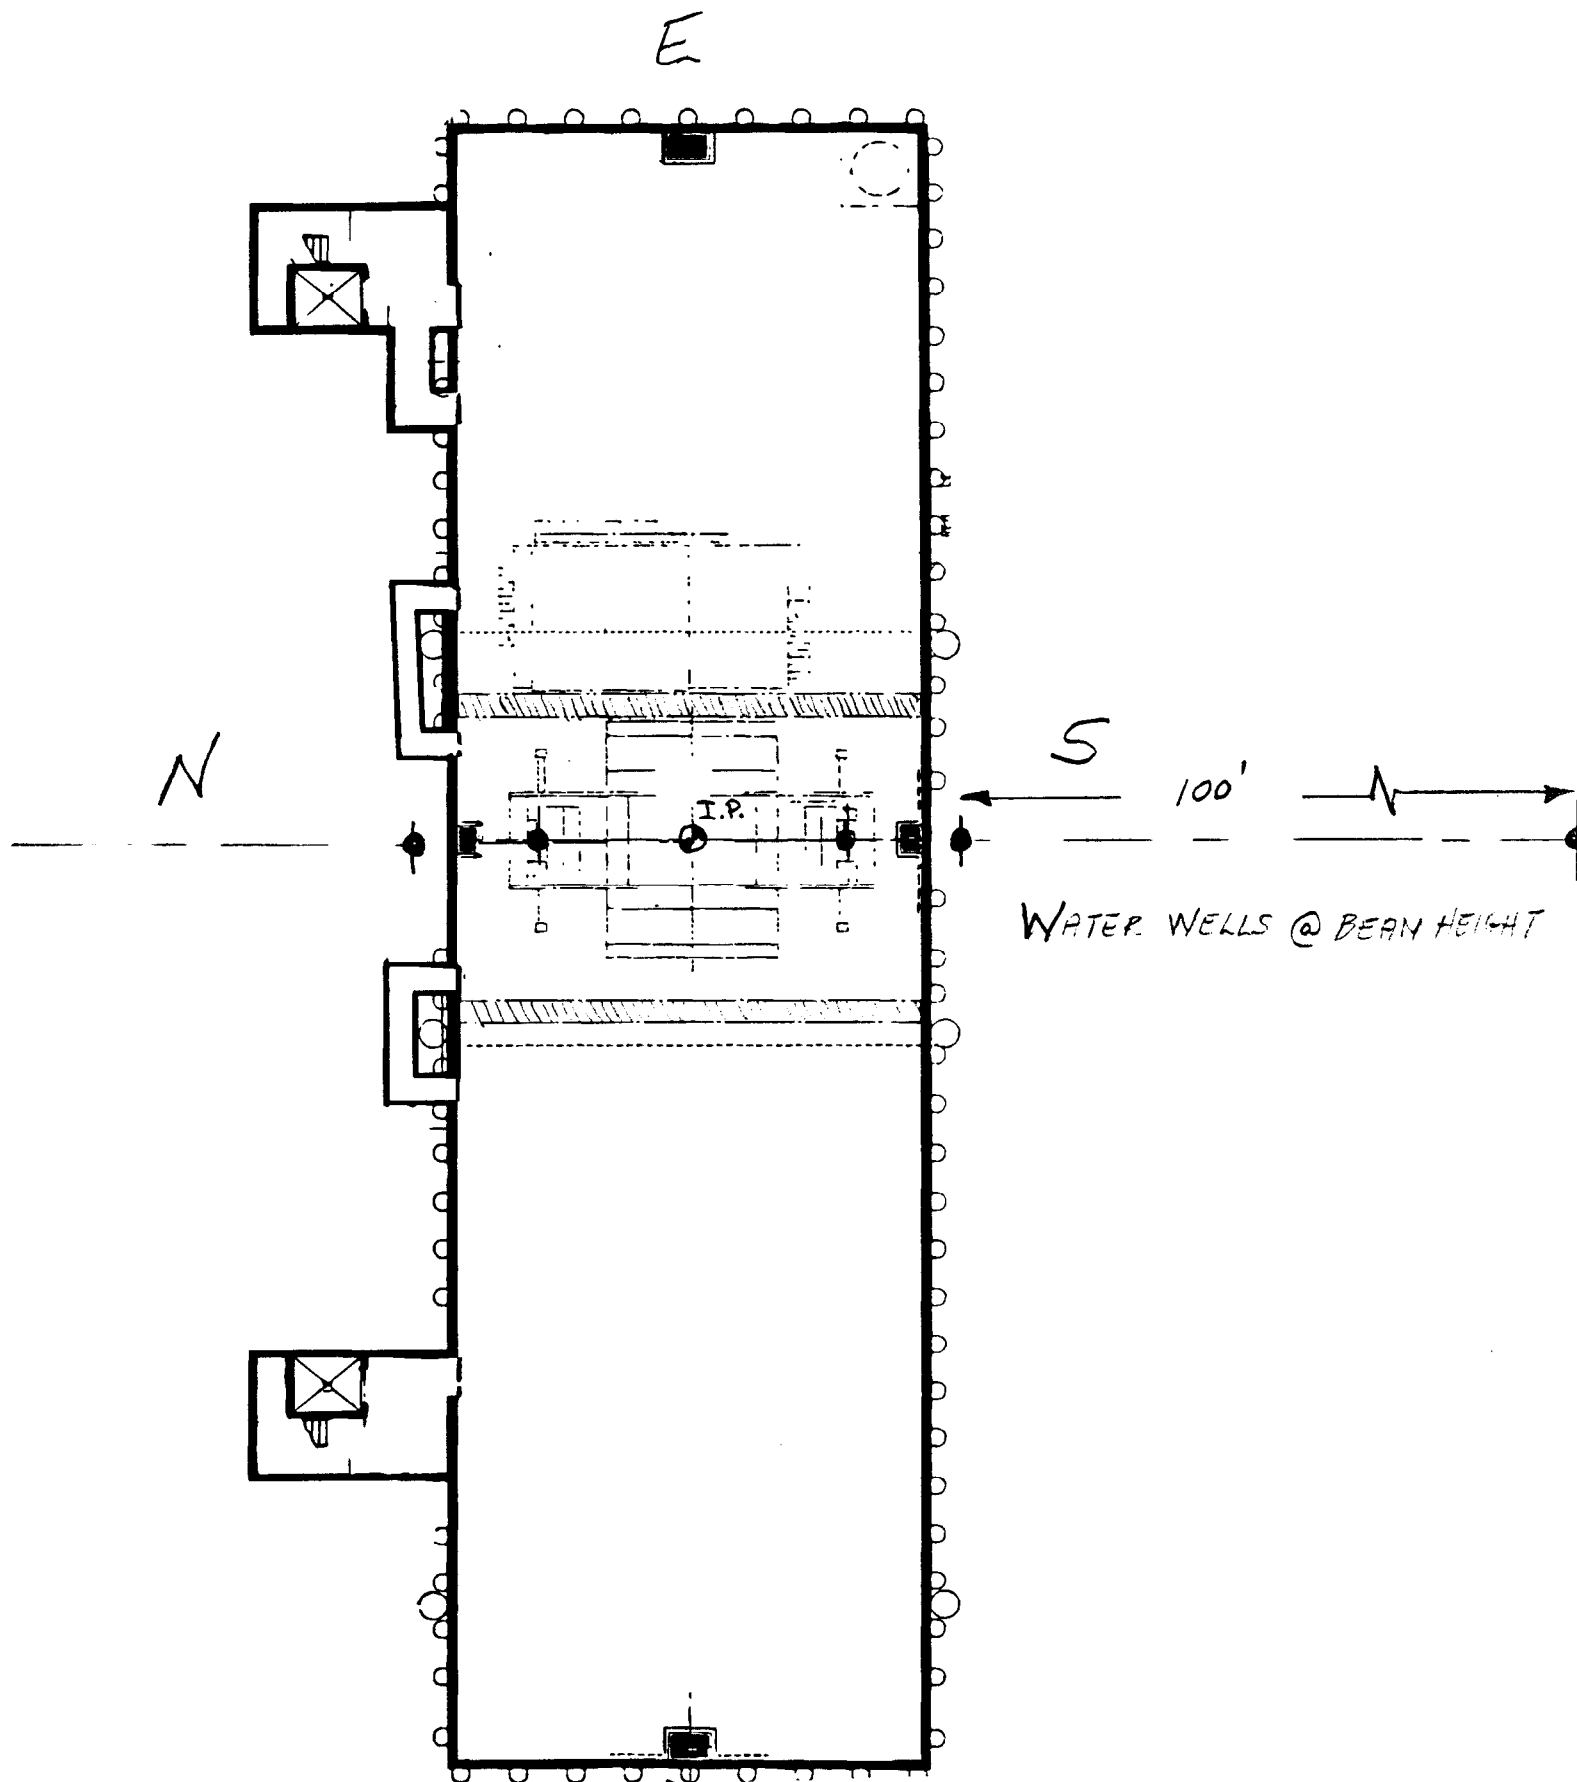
Layout of the Collider Hall Floor during Epoch 2 – Mark II installed.
